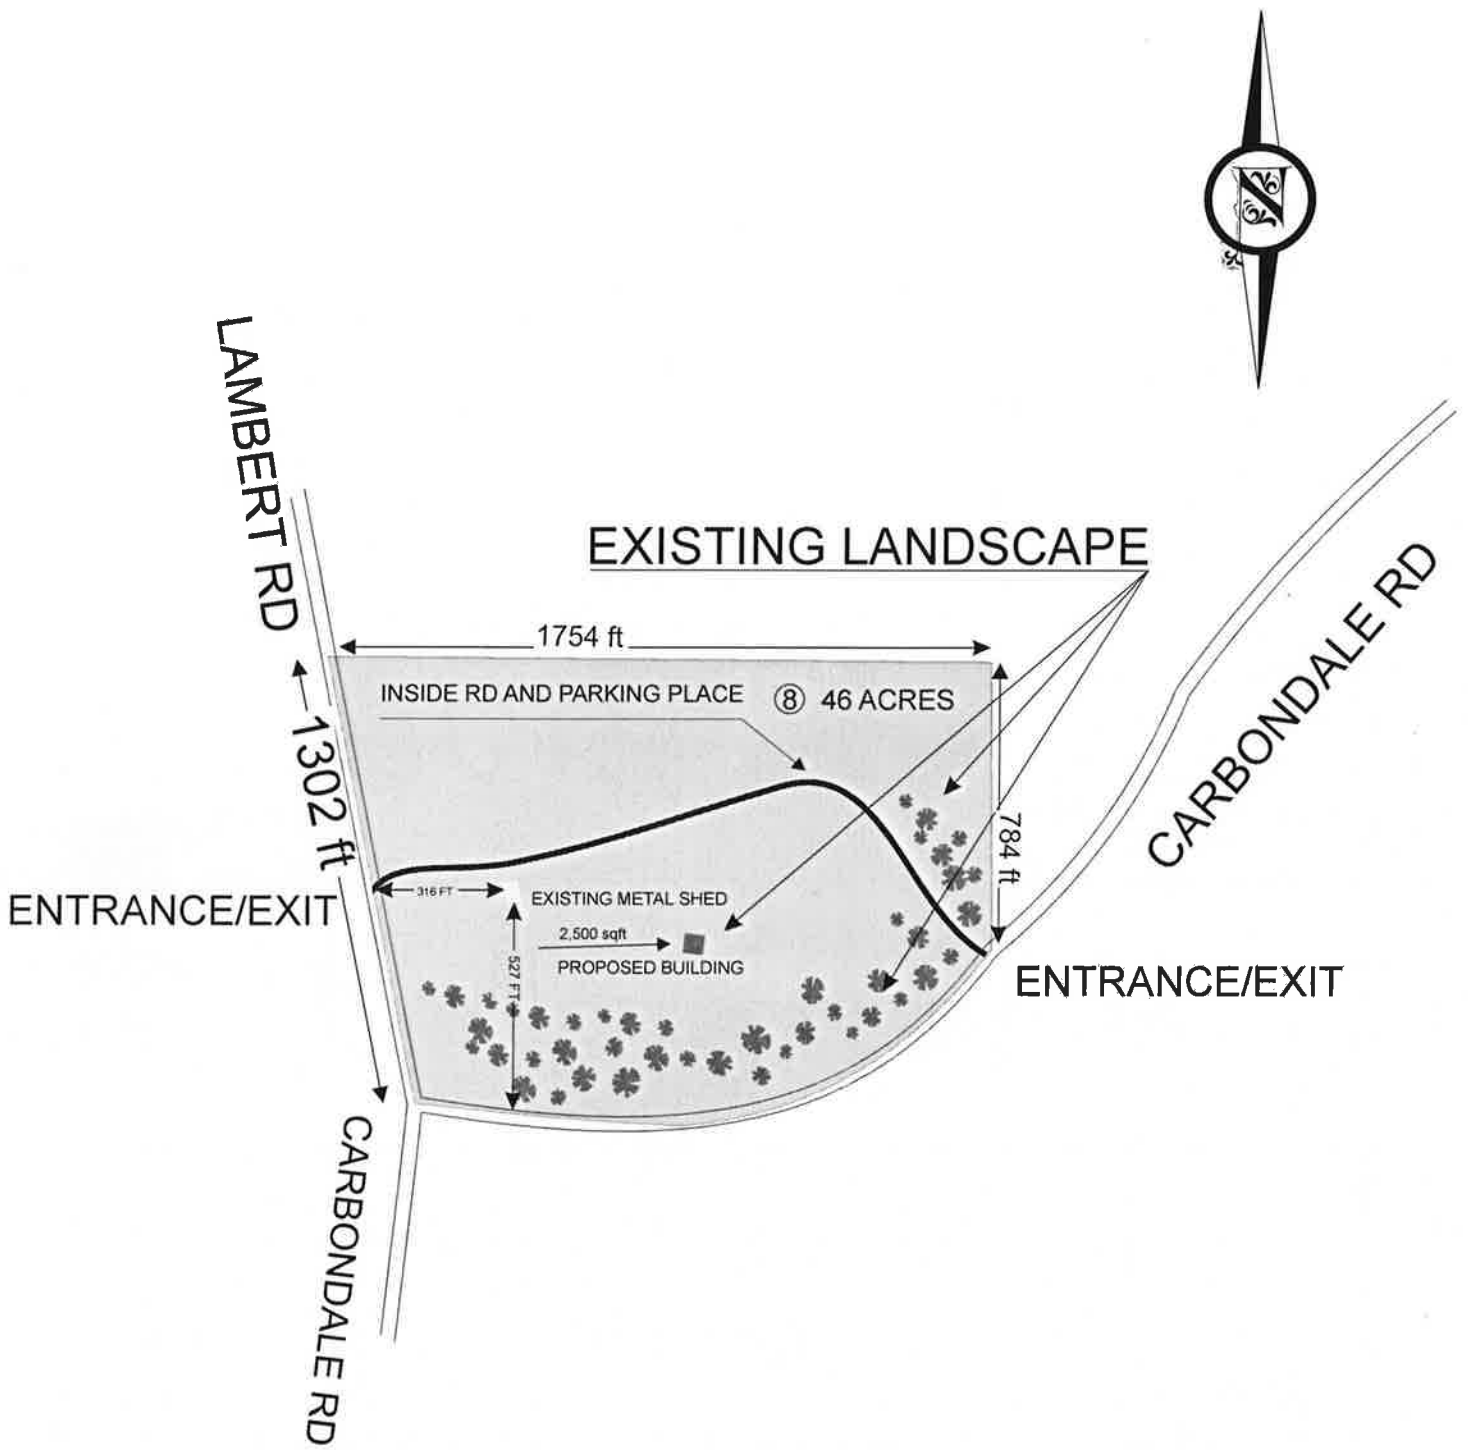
View of Proposed Cemetery Site With proposed Improvements
